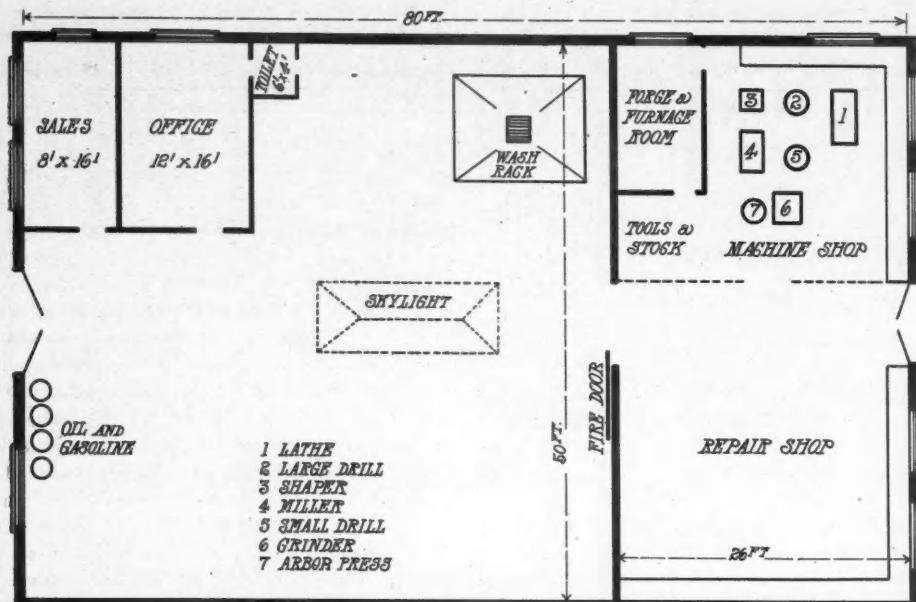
FLOOR PLAN FOR 50 BY 80-FOOT GARAGE WITH LOCATION OF EQUIPMENT
